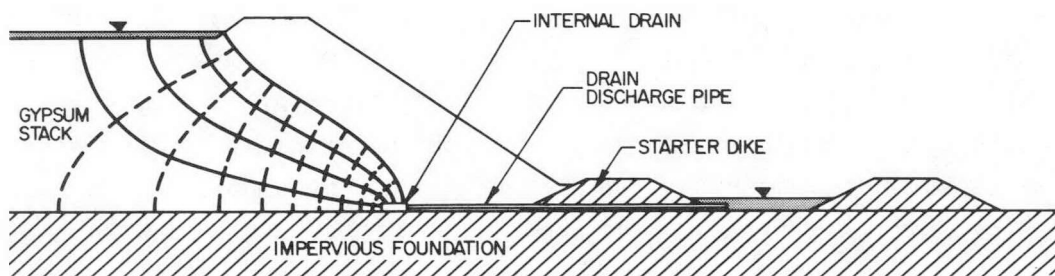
Effect of Internal Drain on Seepage Pattern Through a Gypsum Stack on an Impervious Foundation
